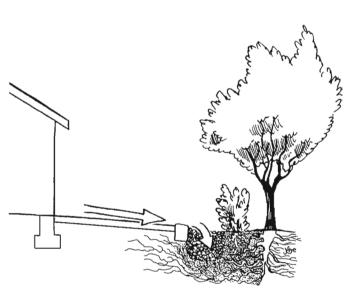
French drain infiltrating intercepted runoff from a roof and patio
